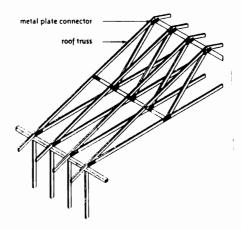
Pre-assembled Roof Trusses (CMHC, 1997)
